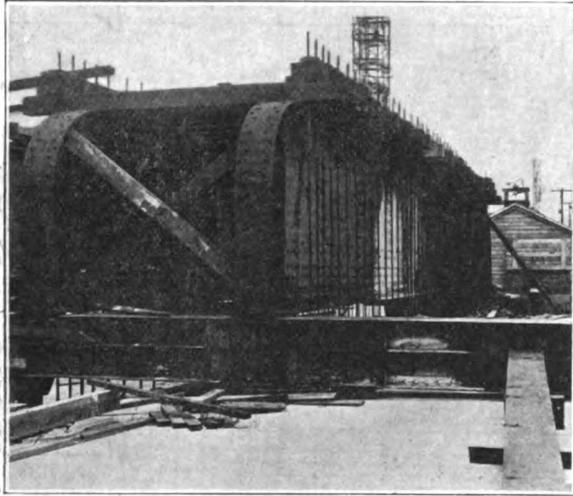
Showing Final Form of Overhanging Girders, Note Cross-beam Supporting the Girders.
